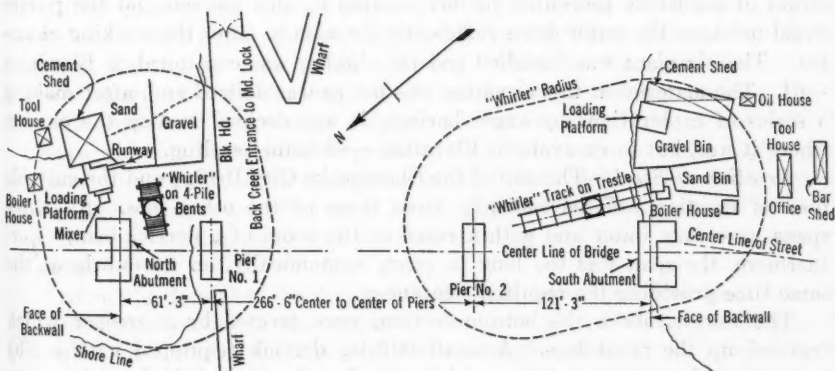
PLANT AND JOB LAYOUT, CHESAPEAKE CITY BRIDGE SUBSTRUCTURE.
